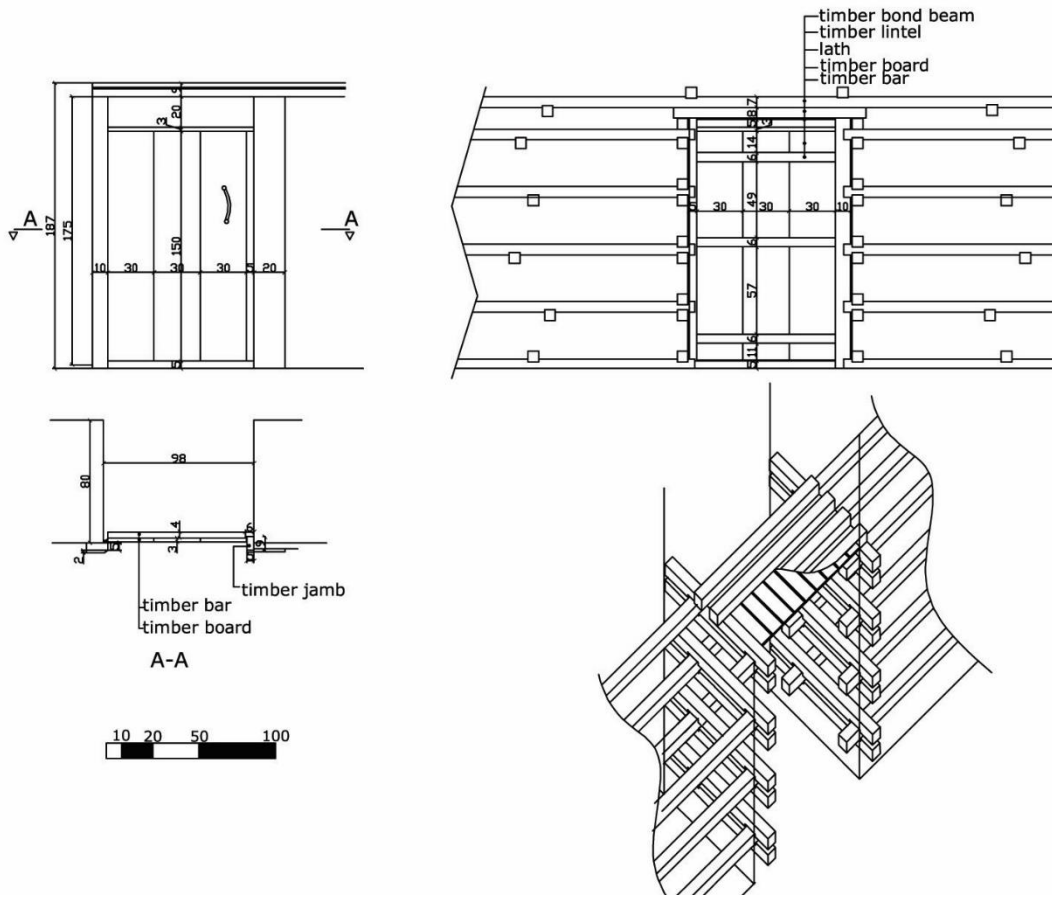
Drawing of the Opening Construction (Çelik 2009)
